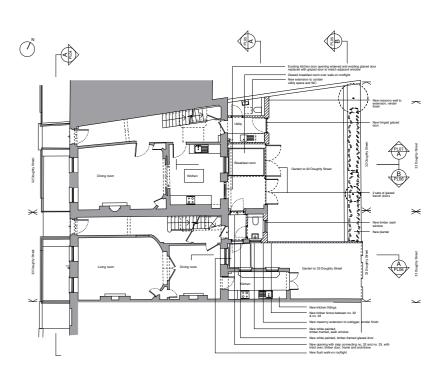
Ground floor plan of 32 and 33 Doughty Street
